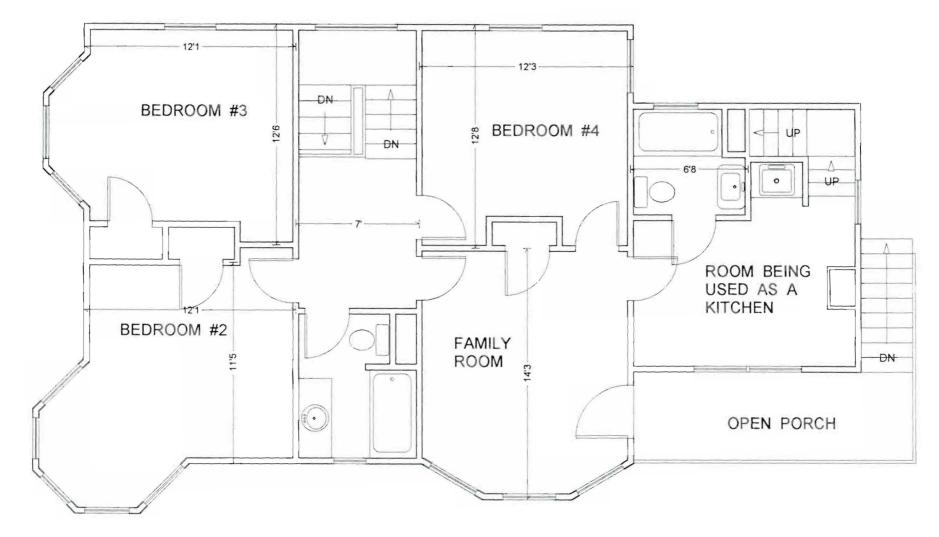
EXHIBIT "B" SECOND FLOOR PLAN "AS IS"
